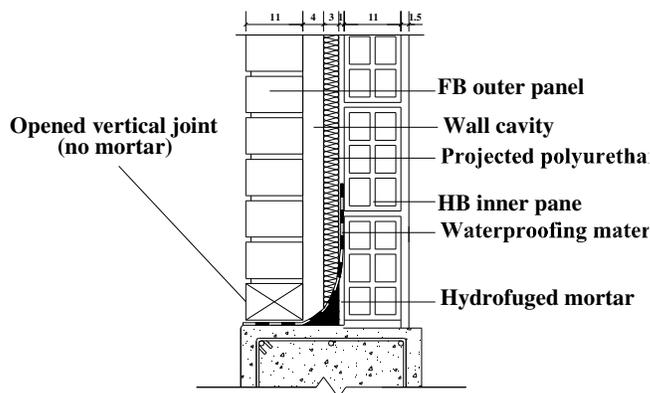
FB cavity wall gutter detail (Camarneiro, 2002).
